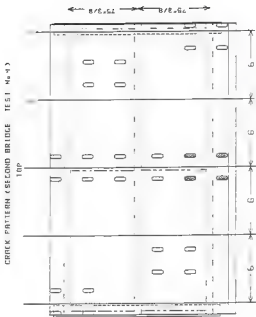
Top Cracking Pattern (Second Bridge - Test No 4)
